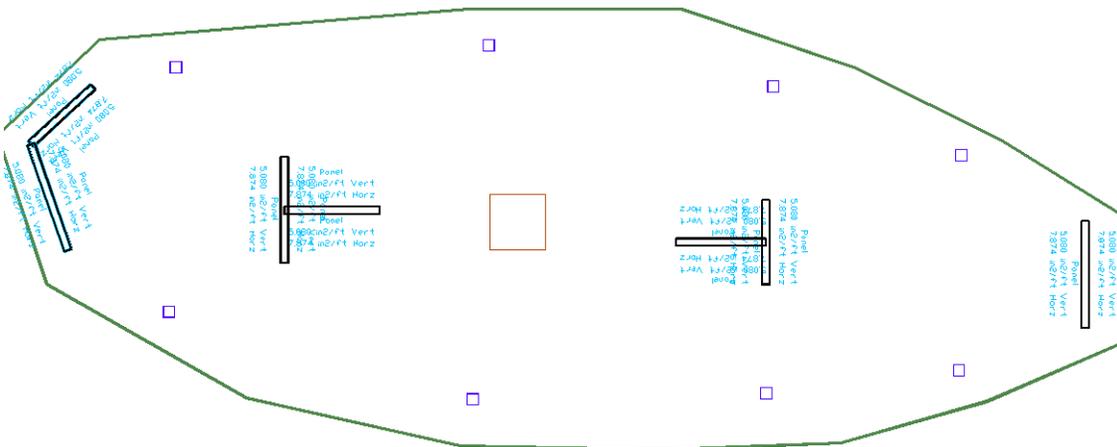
Plan View - Level 1 Panel Reinforcement
